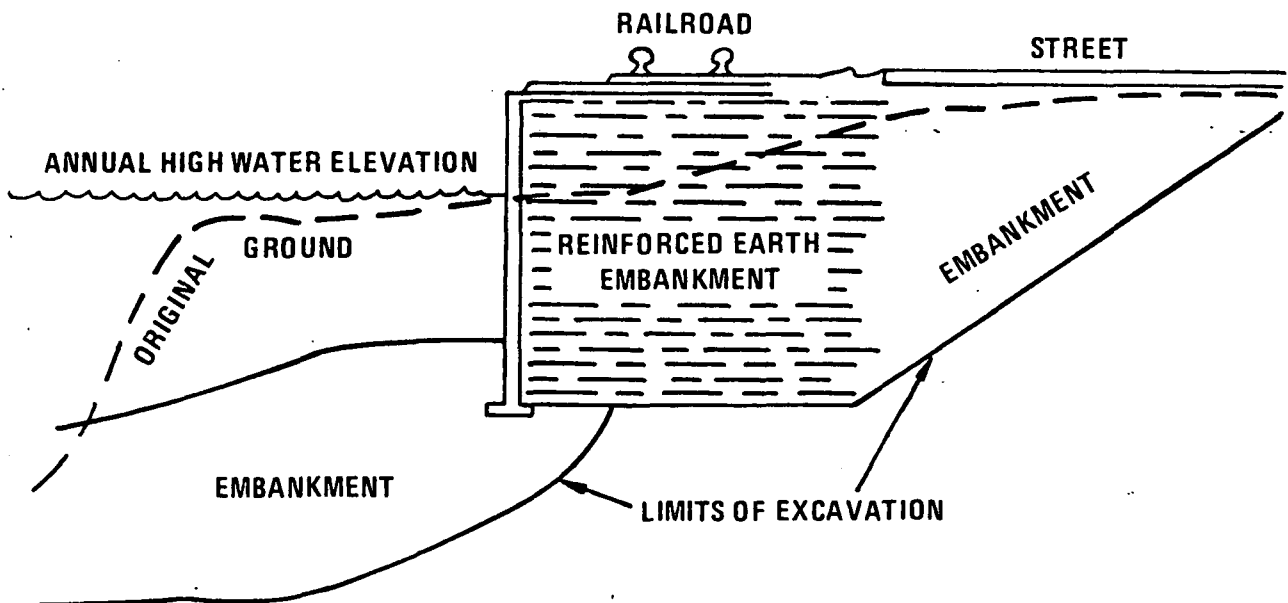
Reinforced Earth Embankment Protected From Erosion By Concrete Panel Face Construction Completed Behind Dike Cofferdam to Exclude Creek (After Reference No. 24).
